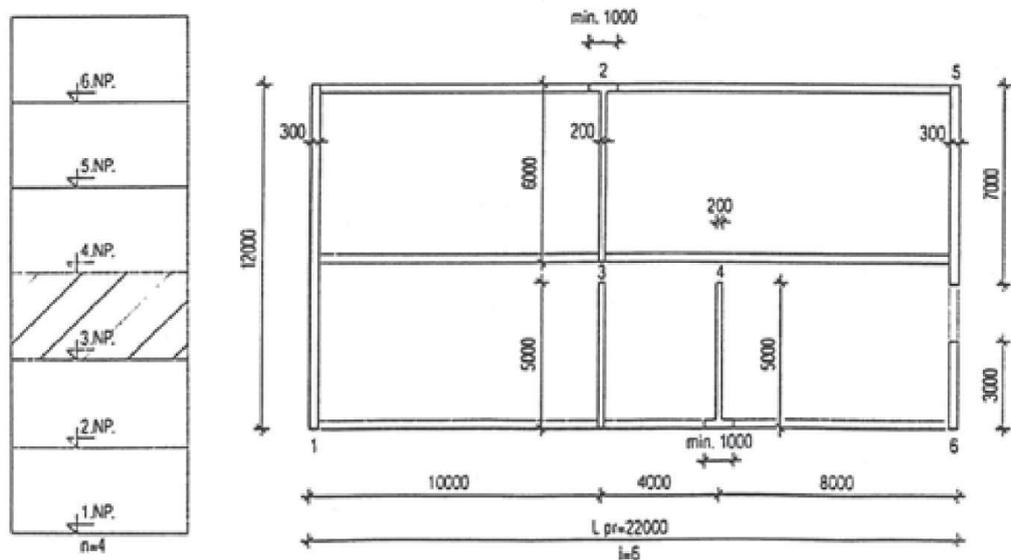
Construction building with longitudinal bearing system and lateral tie walls
